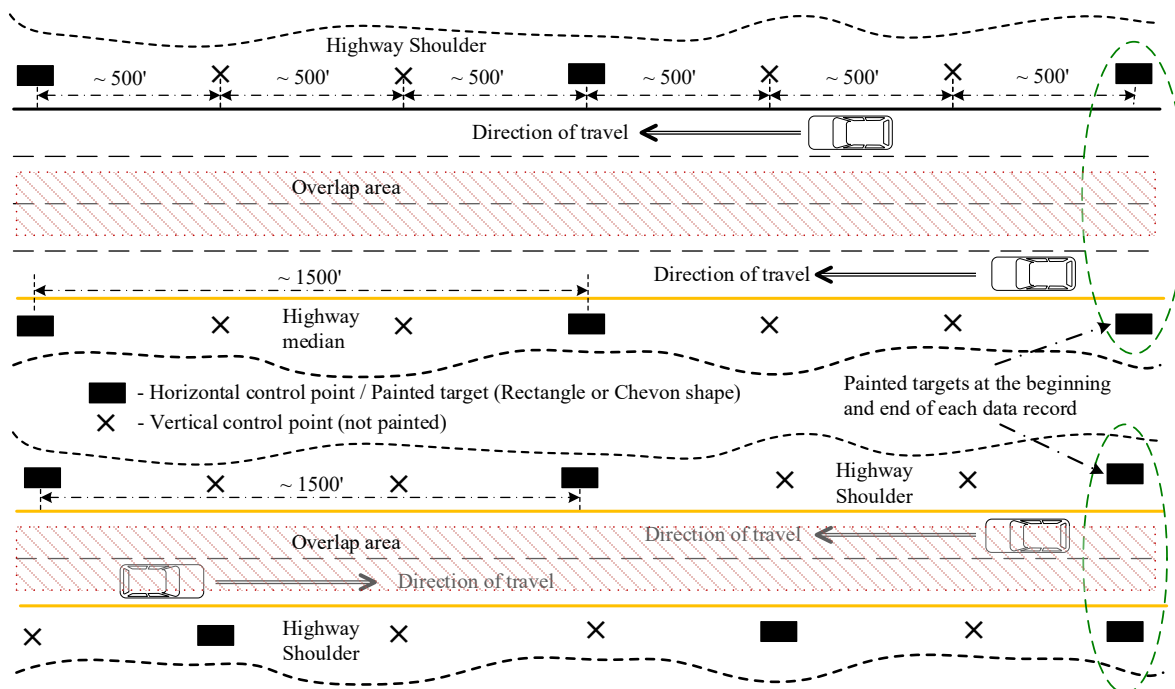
Typical MTLS Type A Local Transformation Layout
